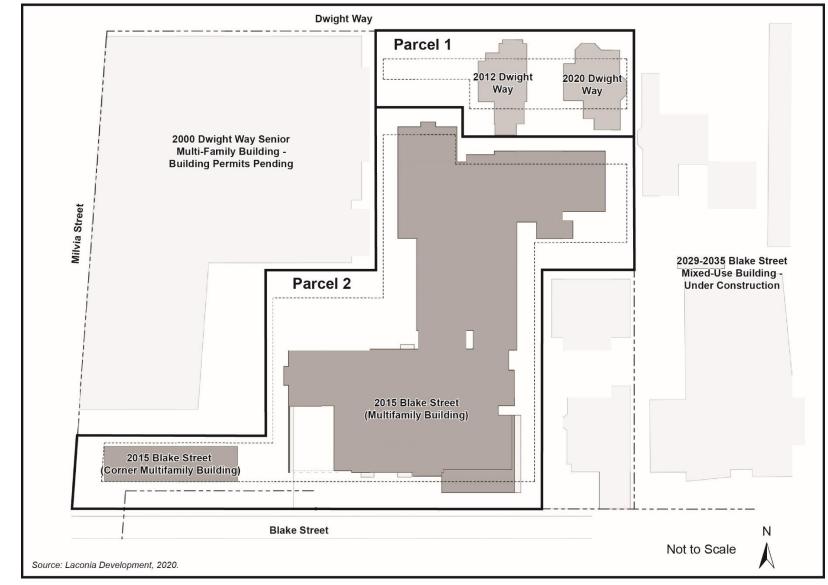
shows the proposed site plan, and Table 1 provides information about the proposed project.
